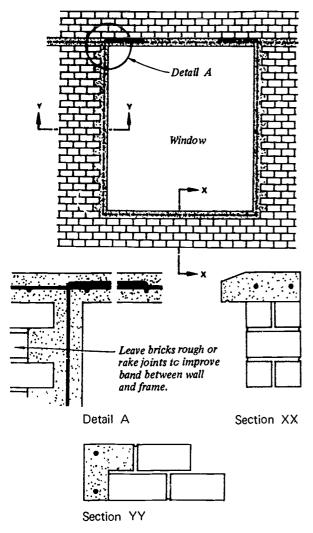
Reinforcement around openings 9.6 Horizontal band or ring beam
